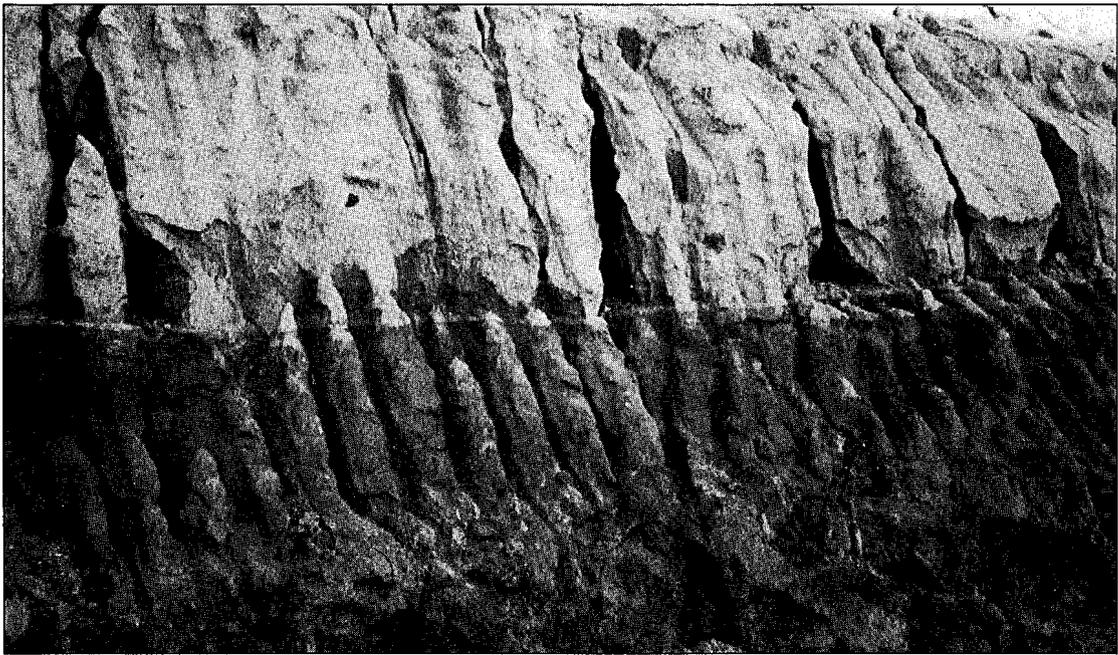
Erosion of cut slope in Cretaceous soils during Bouldin Dam reconstruction.
